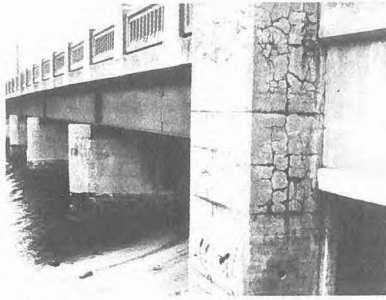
Map-cracking in an abutment of the bridge due to AAR.
